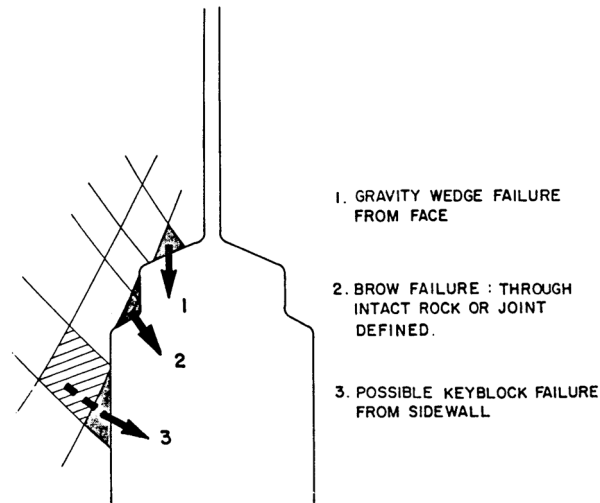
POSSIBLE MODES OF WALL AND FACE FAILURE
